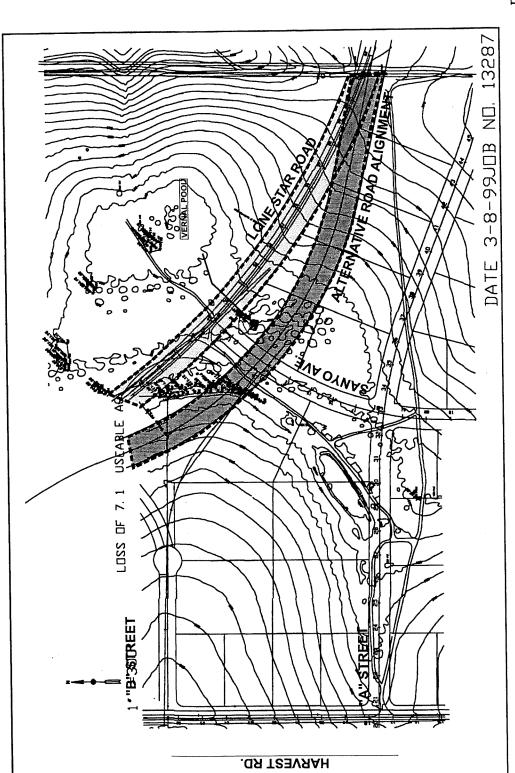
ALTERNATIVE ROAD ALIGNMENT FOR LONE STAR ROAD
